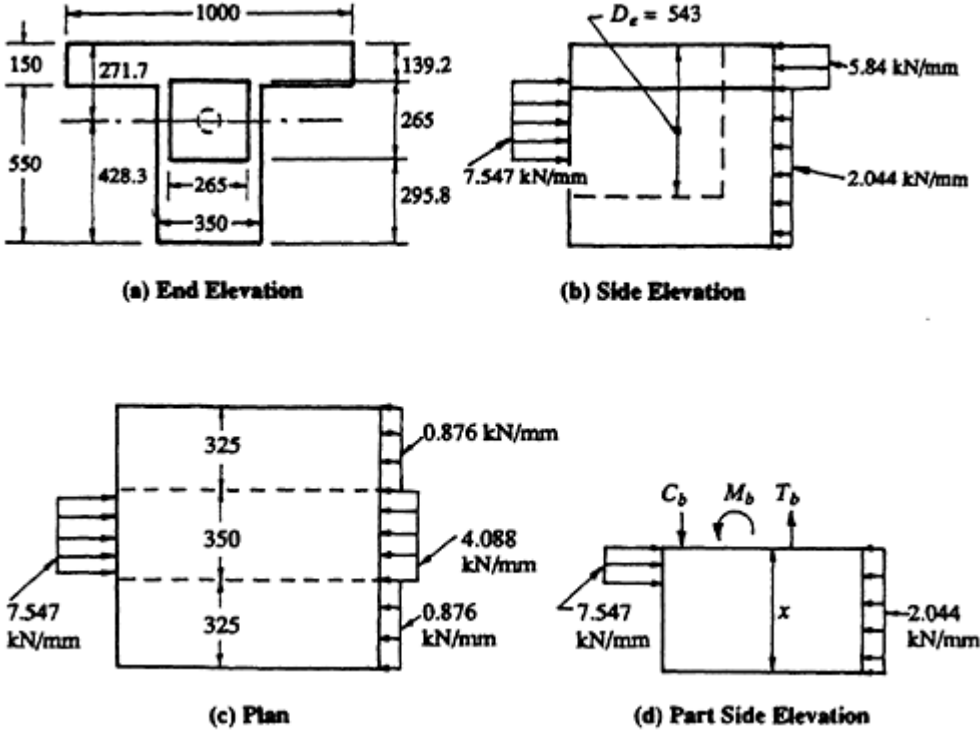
Details of the anchorage zone of the T-beam in [Example 6.3](#).
